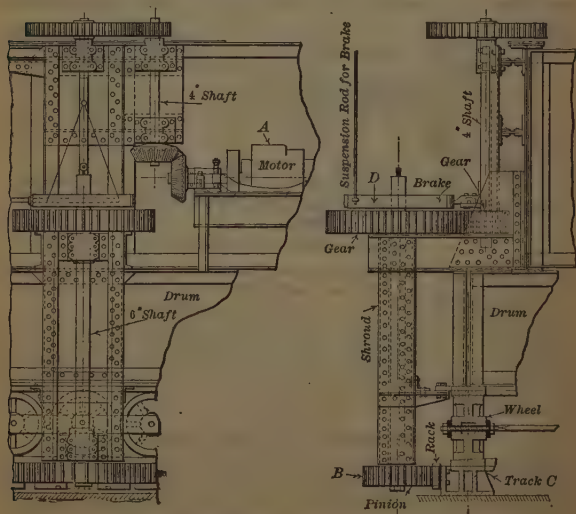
Turning Mechanism, Charlestown Bridge, Boston, Mass.
